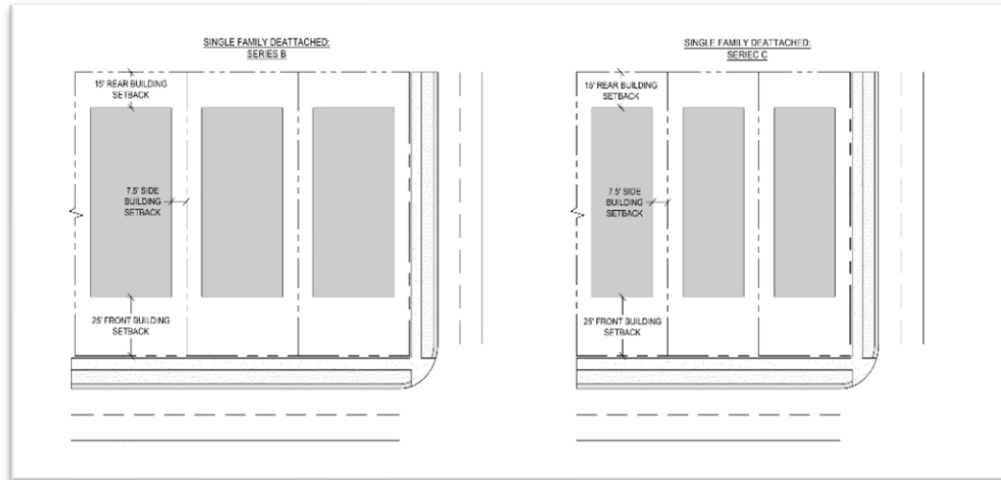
Showing building setback spacing for single family detached (Series B&C)
